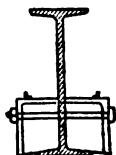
Wooden Beam Framed to I Beam with Duplex Shelf-hanger
